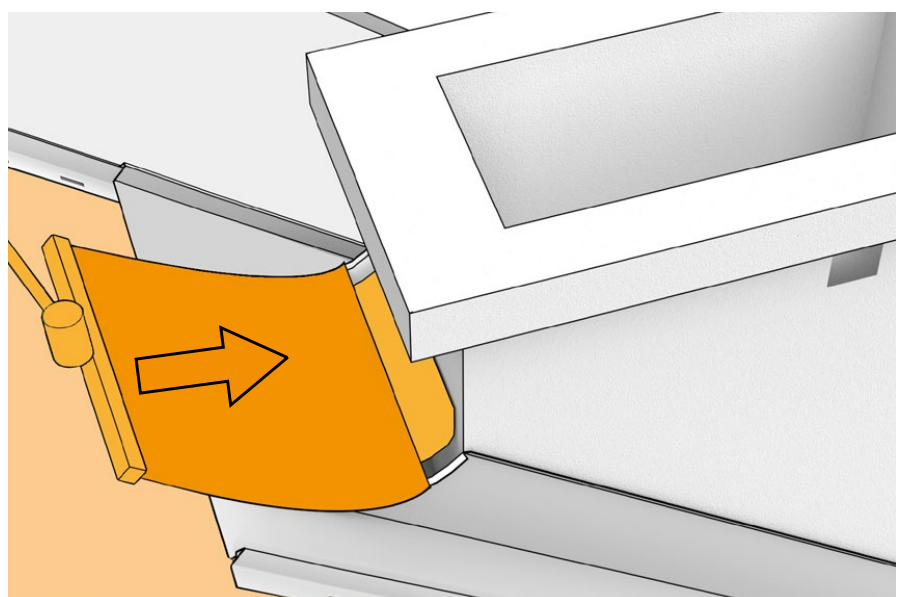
UPPER STACK FLASHING ASSEMBLY
